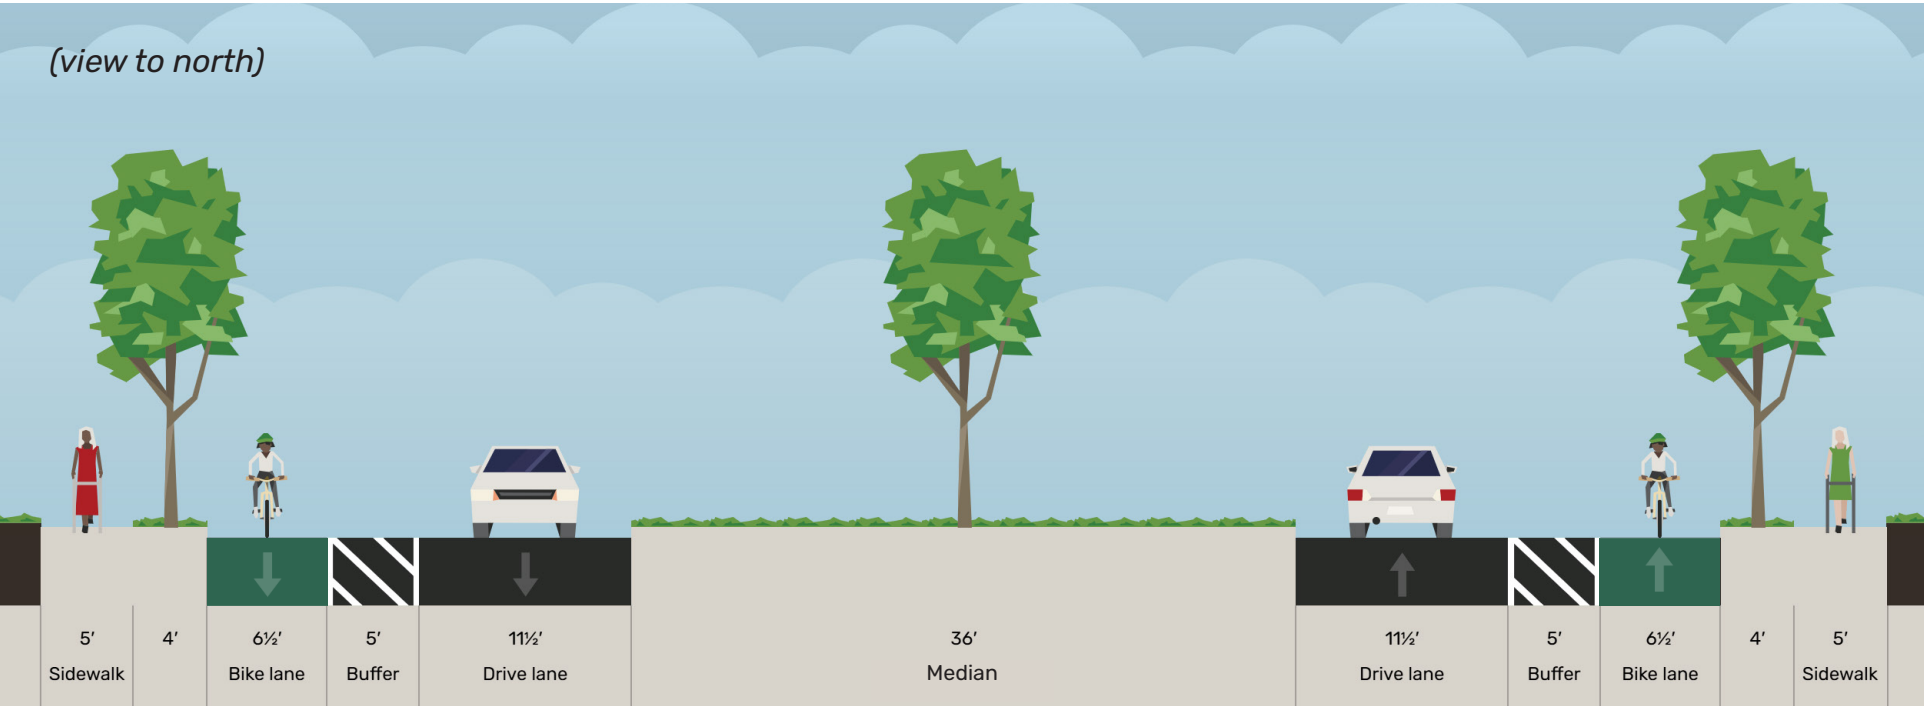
Proposed Typical Cross-Section on Post Oak Drive (IH 35 to Robinson Road) (100' ROW)
